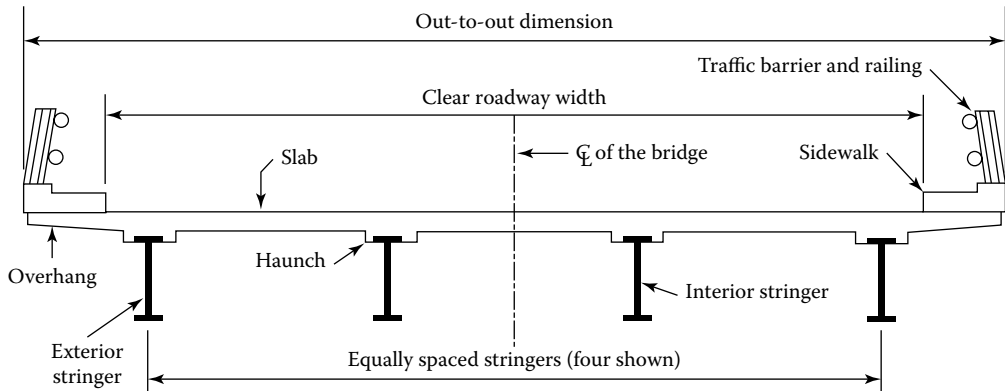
Typical cross section of a slab-girder bridge with sidewalks.
